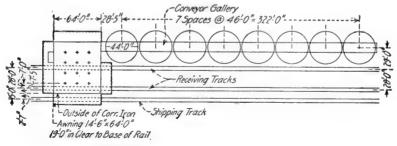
PLAN OF INDEPENDENT ELEVATOR.
